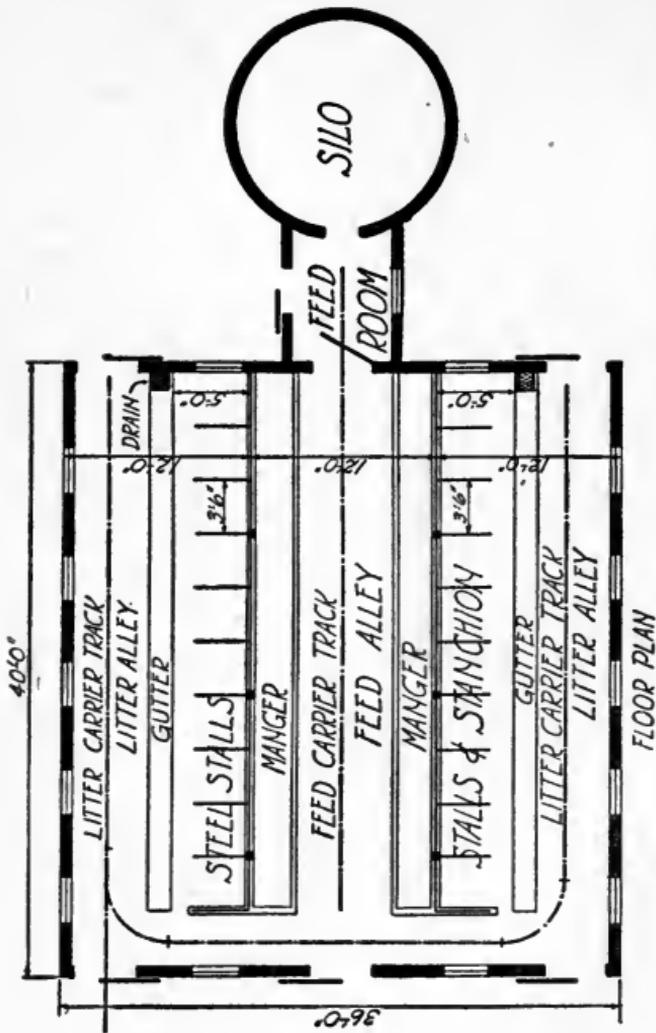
Floor Plan of Monitor Roof Stable Showing Large Silo Opposite a Central Feed Alley
